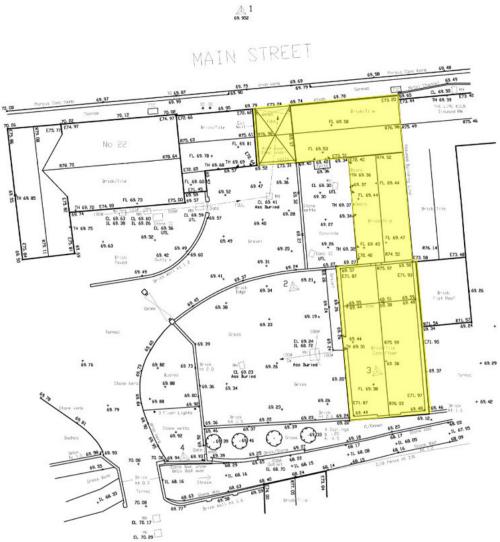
Site plan with surveyed buildings highlighted Modified and annotated from plan supplied by client. Limes farmhouse on left
